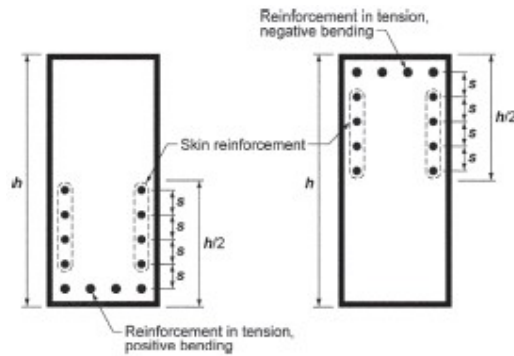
The position of the main reinforcement and the additional reinforcement according to ACI 318-14 [6]
